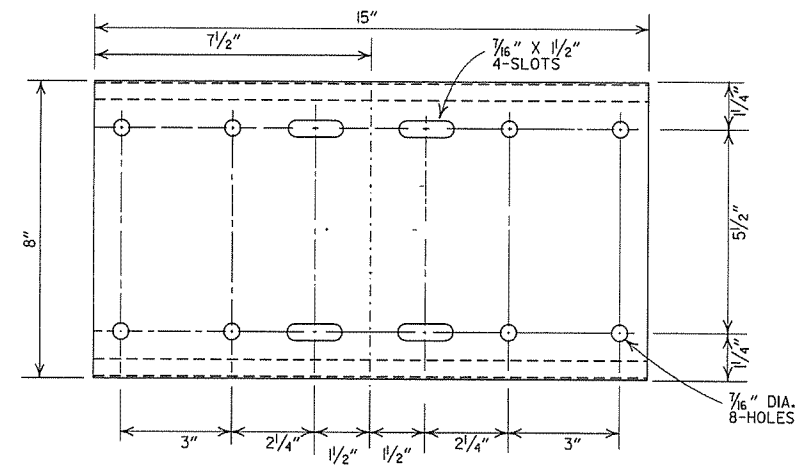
DETAIL OF TERMINAL ANCHOR POST (TYPE I)
